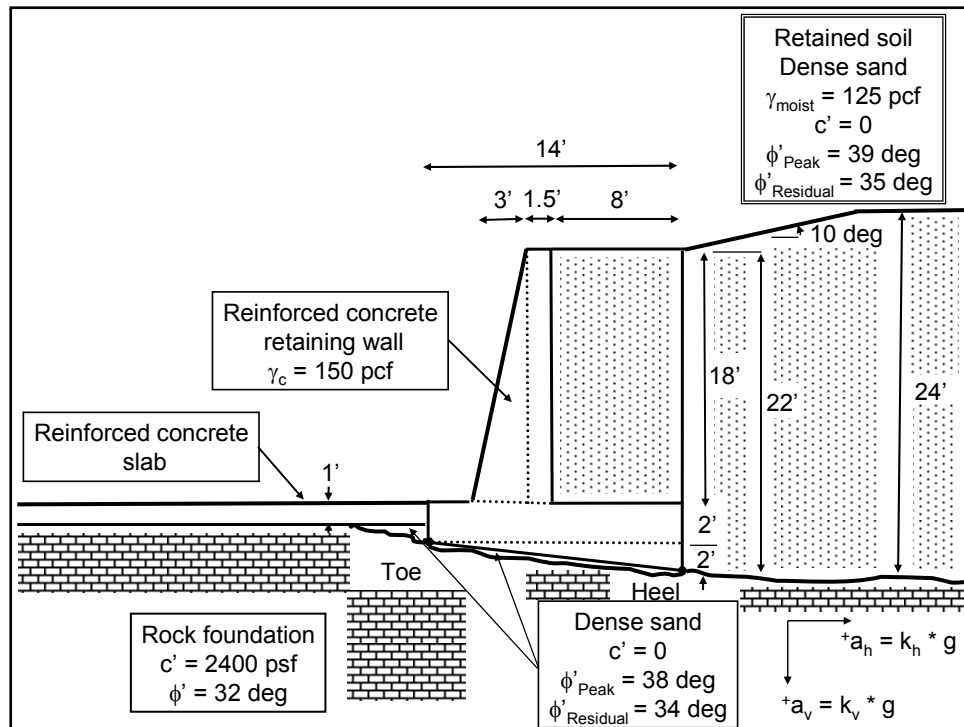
Rock-founded earth retaining wall buttressed at the toe of the wall by a 1-ft-thick reinforced concrete slab for Example 2.
